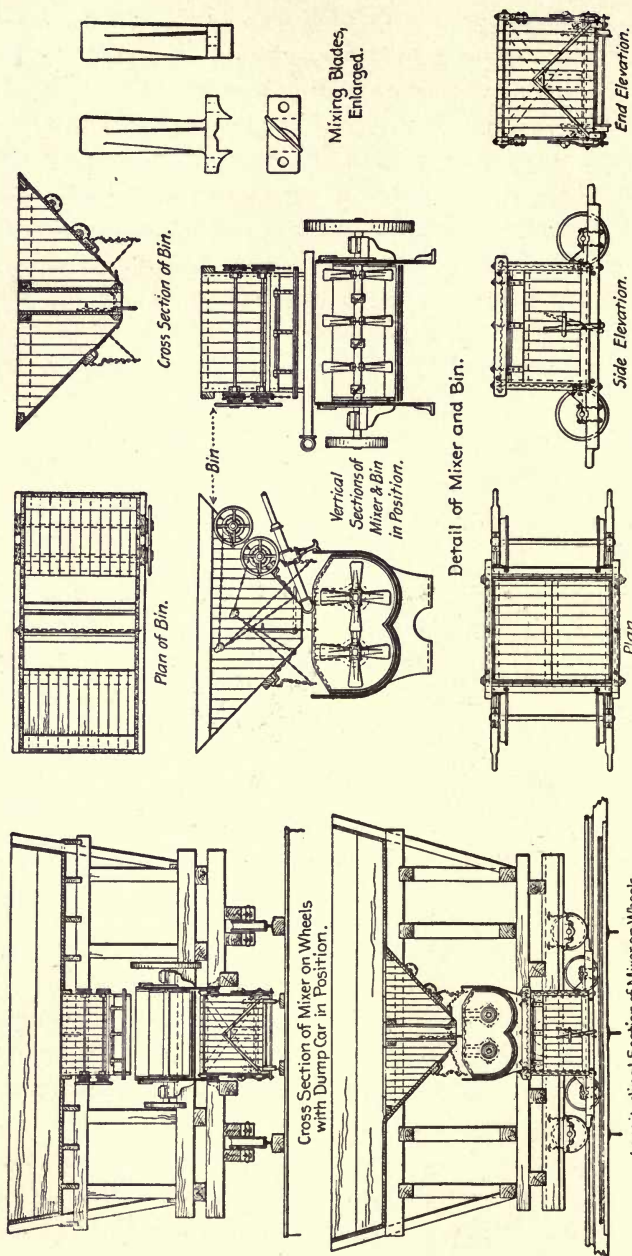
Concrete-mixing Plant: New Orleans Drainage.
